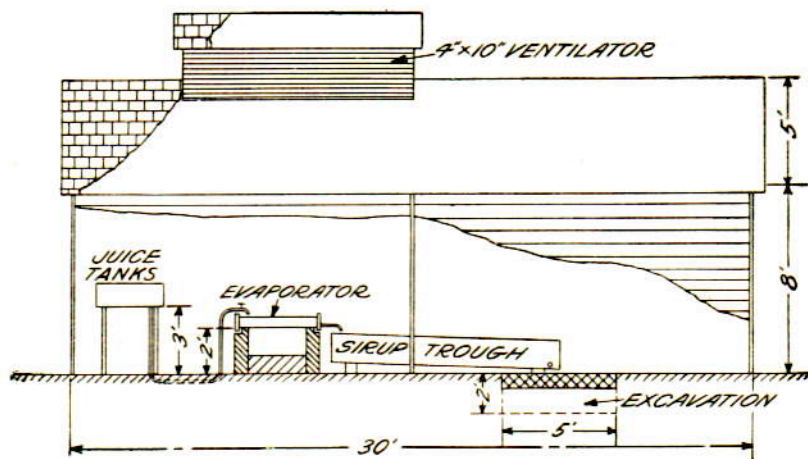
Sectional side elevation of a pan house on level ground.
